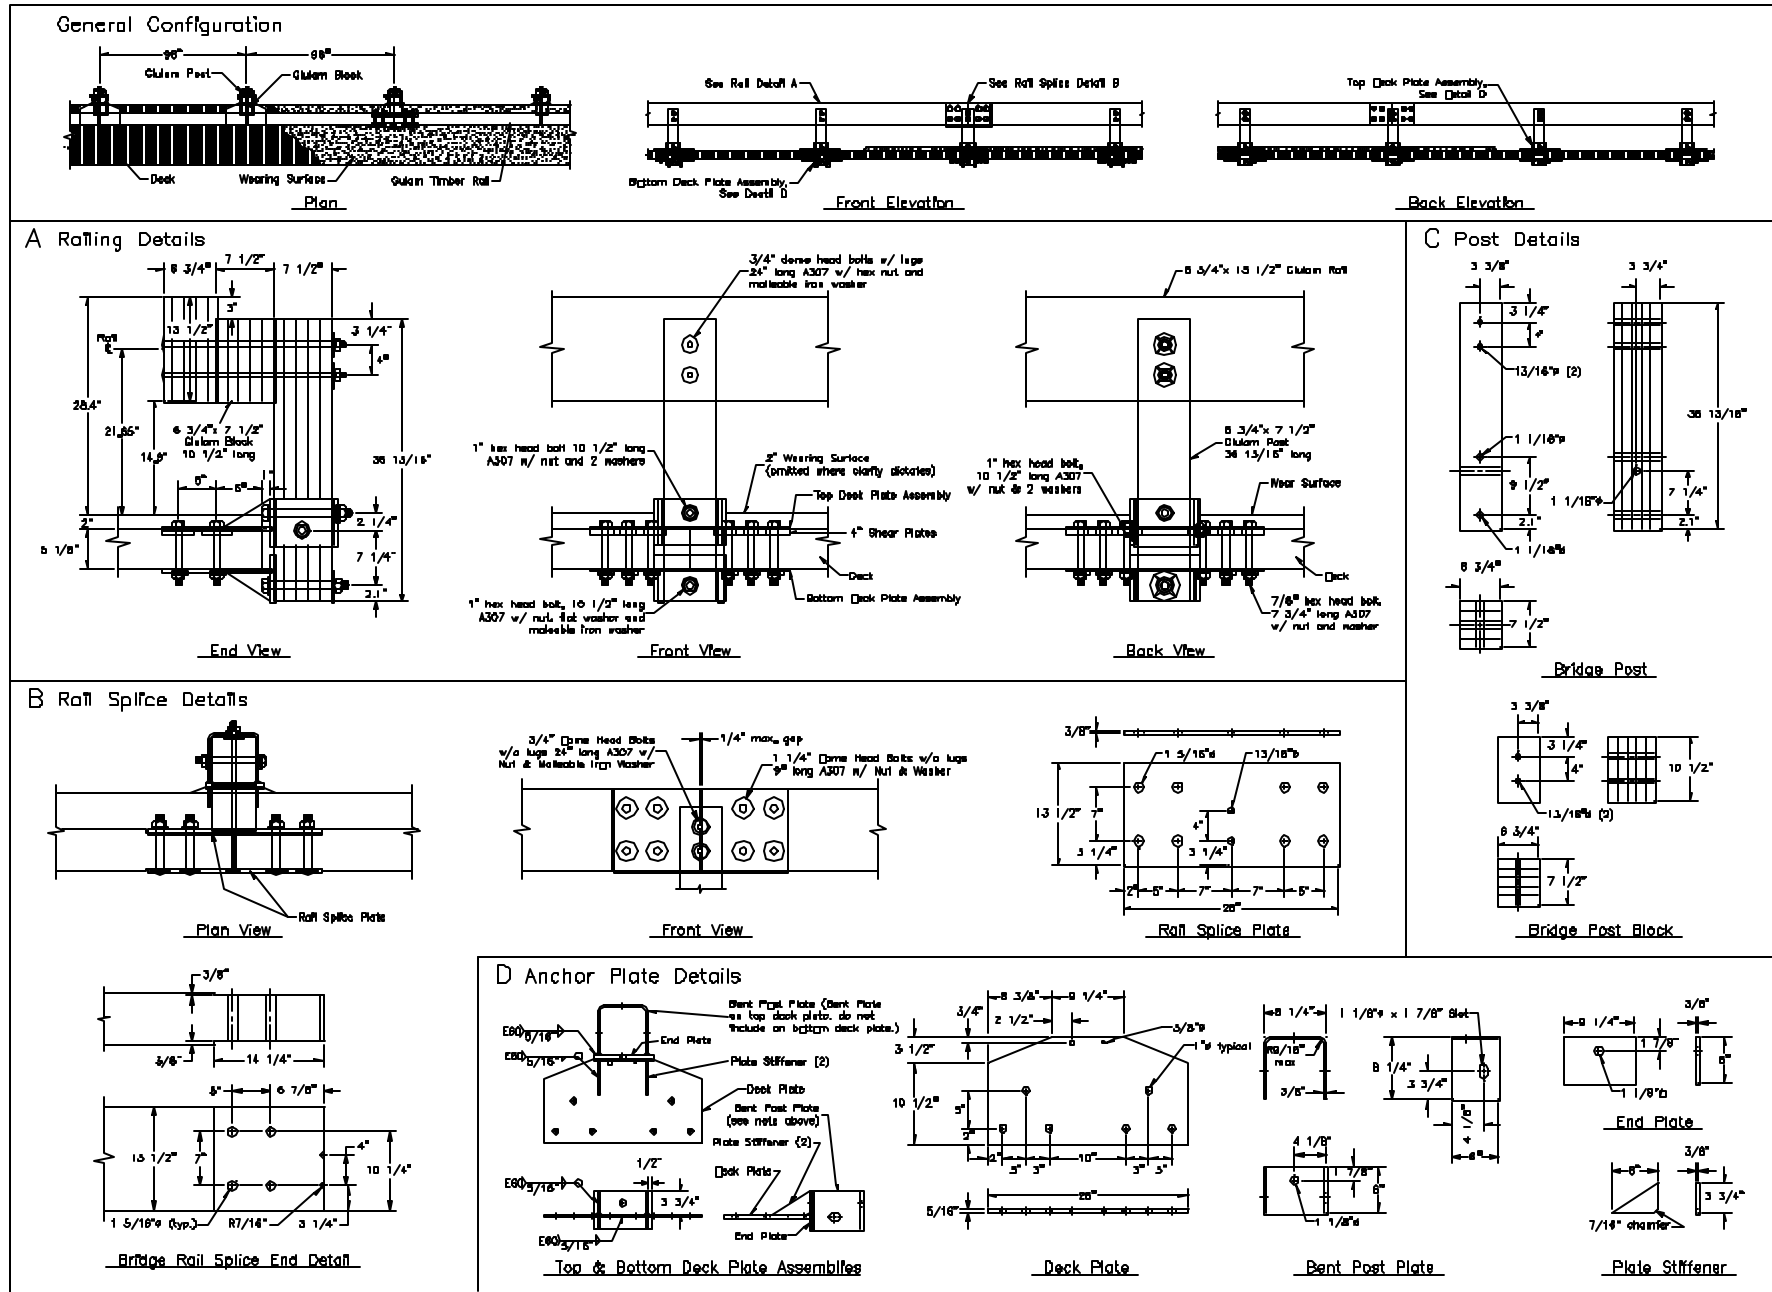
Wood Bridge Railing Design Details. System No. 2 (1 in. = 25.4 mm).
